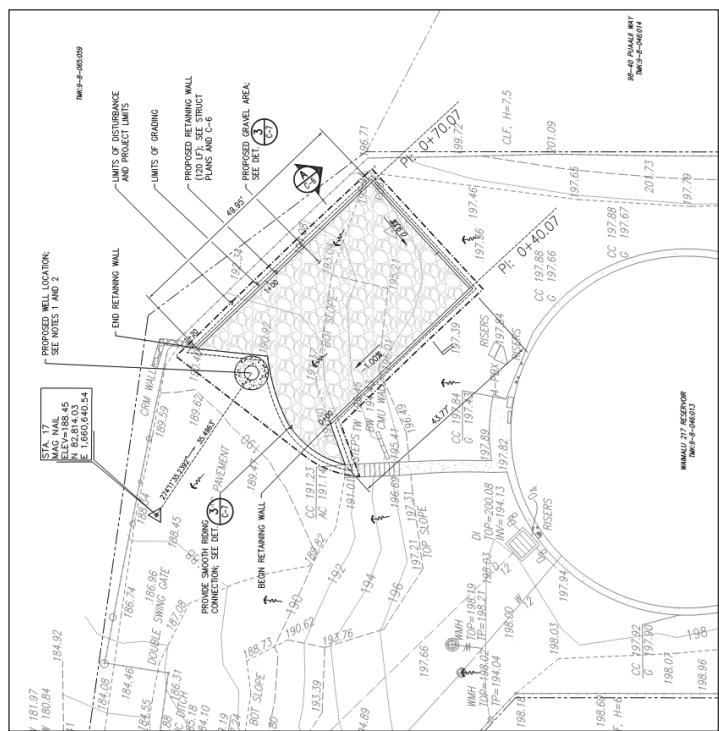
Schematic shows proposed placement of exploratory well and retaining wall. Source: Limtaco Consulting Group.
